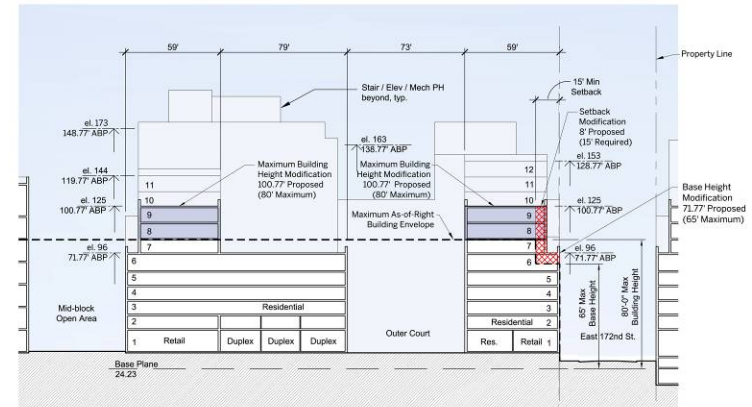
E: Buildings 2A / 2B - Proposed Height and Setback Waivers (Sections)
